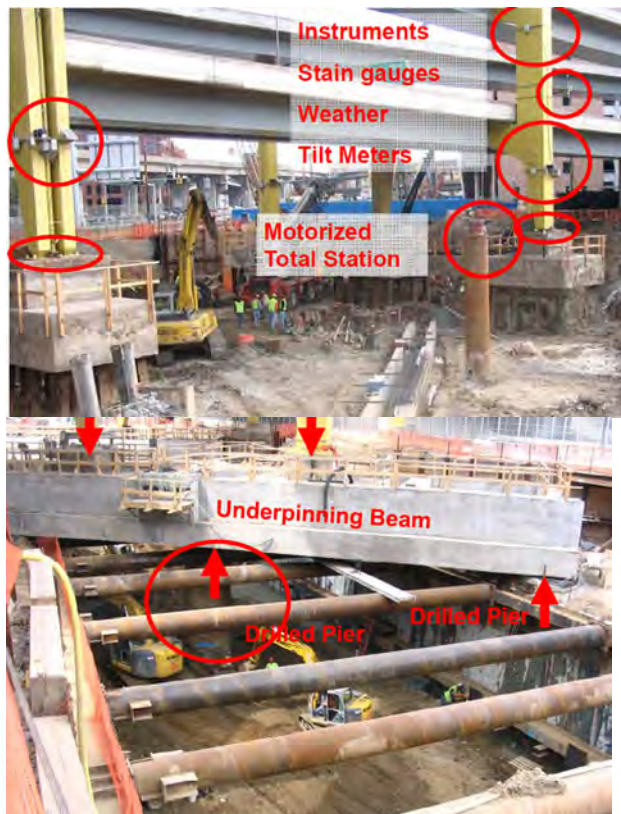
Underpinning of Existing Viaduct – Cut and Cover SOE Walls Used for Underpinning of the Viaduct for the Central Artery Tunnel Project in Boston (Massachusetts Highway Department, Central Artery Tunnel Drawings, 1996)
